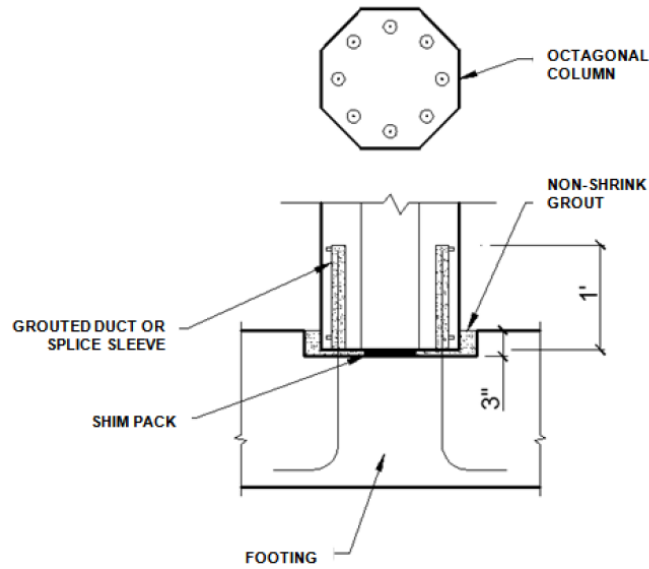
Precast column-footing connection with grouted duct/splice sleeve and socket connection proposed by Aktan and Attanayake (2013)
